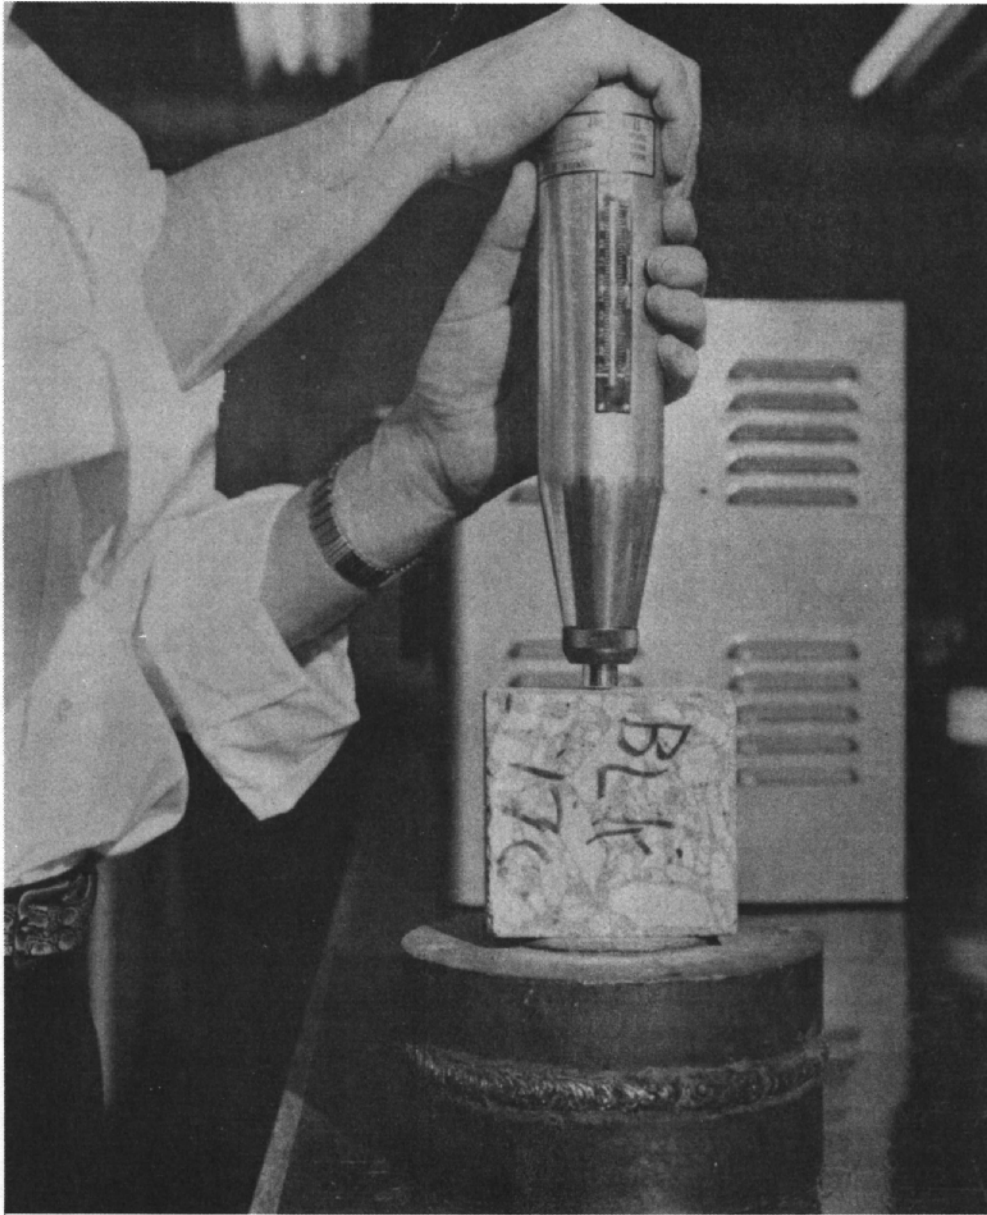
Photograph of impact hammer (small concrete test hammer--Type "L").
